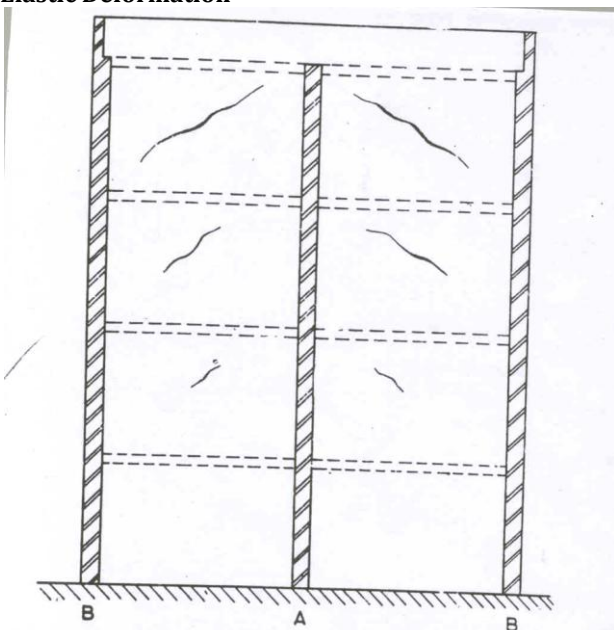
Diagonal Cracks in Cross Walls of Multi-Storied Load Bearing Structures
